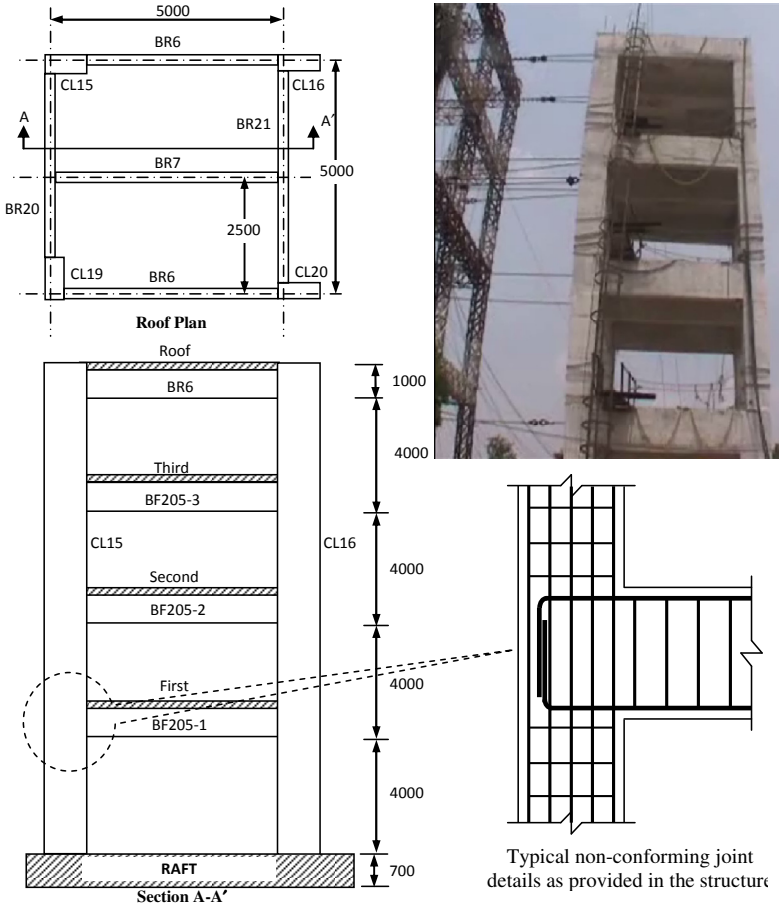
Details of full scale NSD structure tested by Sharma et al. (2013)
